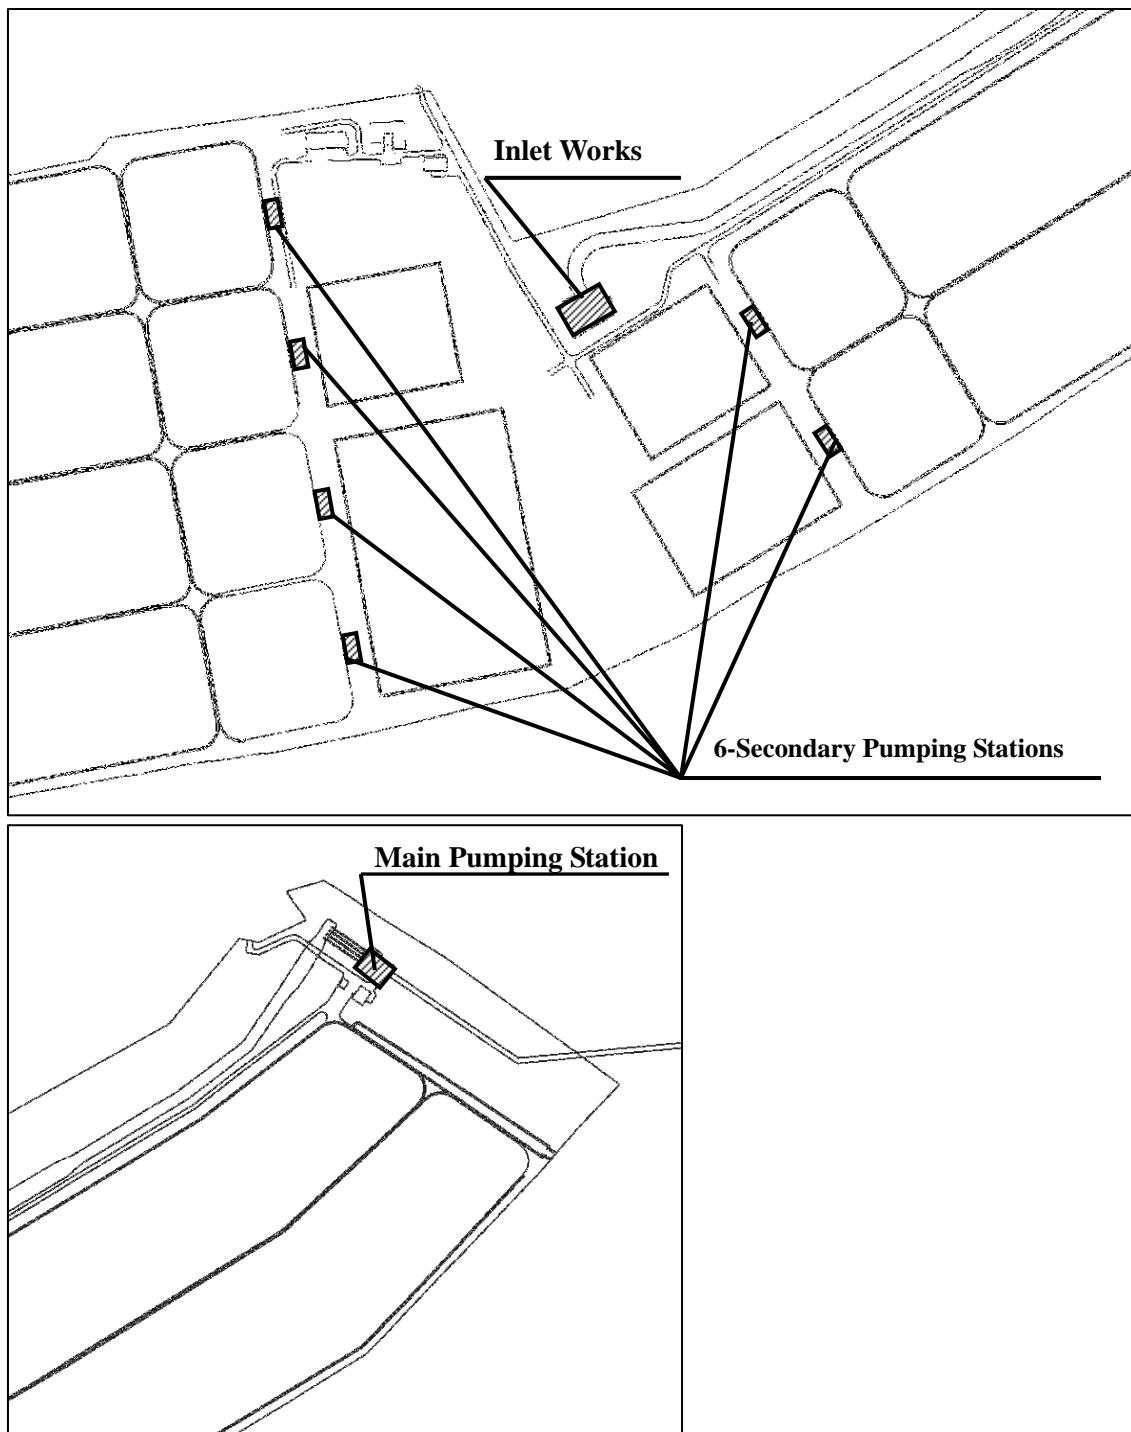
shows general plan of sewage treatment plant TP-3.
